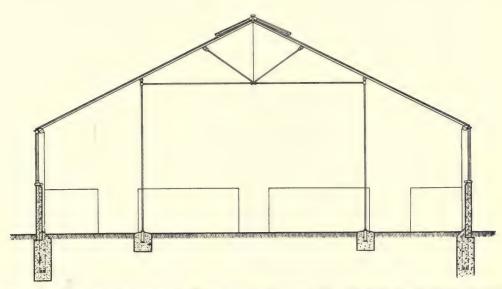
CROSS SECTION OF A TWENTY-FOUR-FOOT BENCH, SEMI-IRON HOUSE
